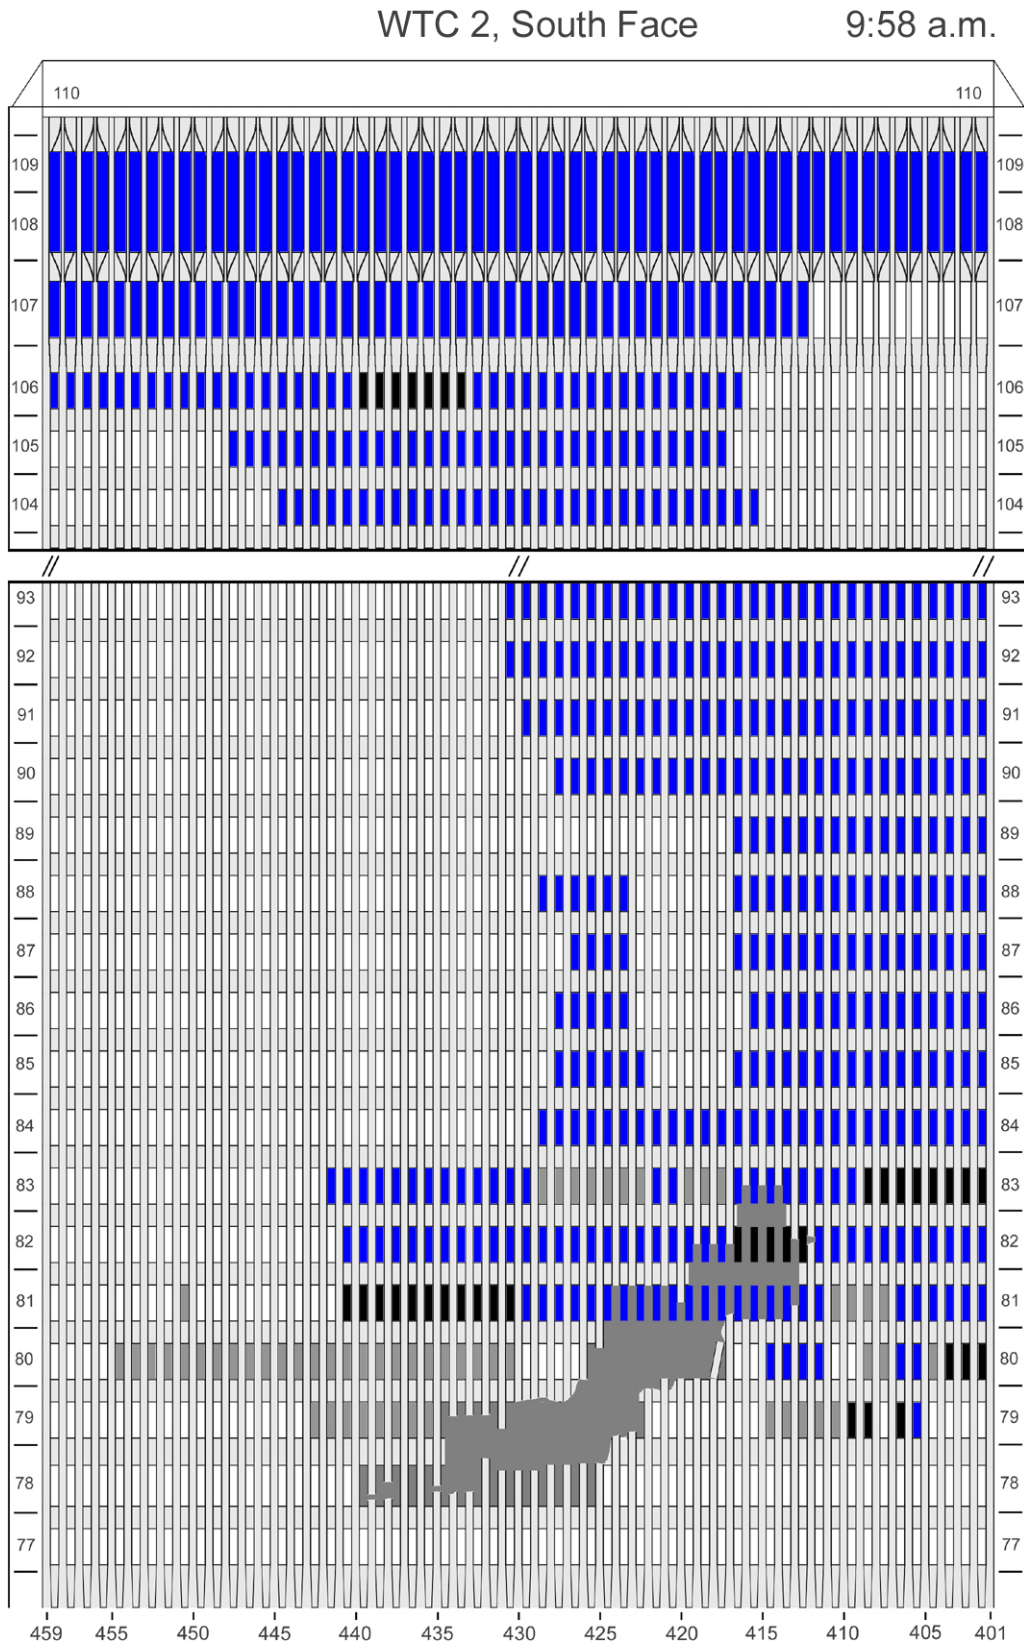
Diagram of the south face of WTC 2 for floors 77 to 93 and floors 104 to 110 at 9:58 a.m. showing windows where smoke was observed and those hidden from view.
